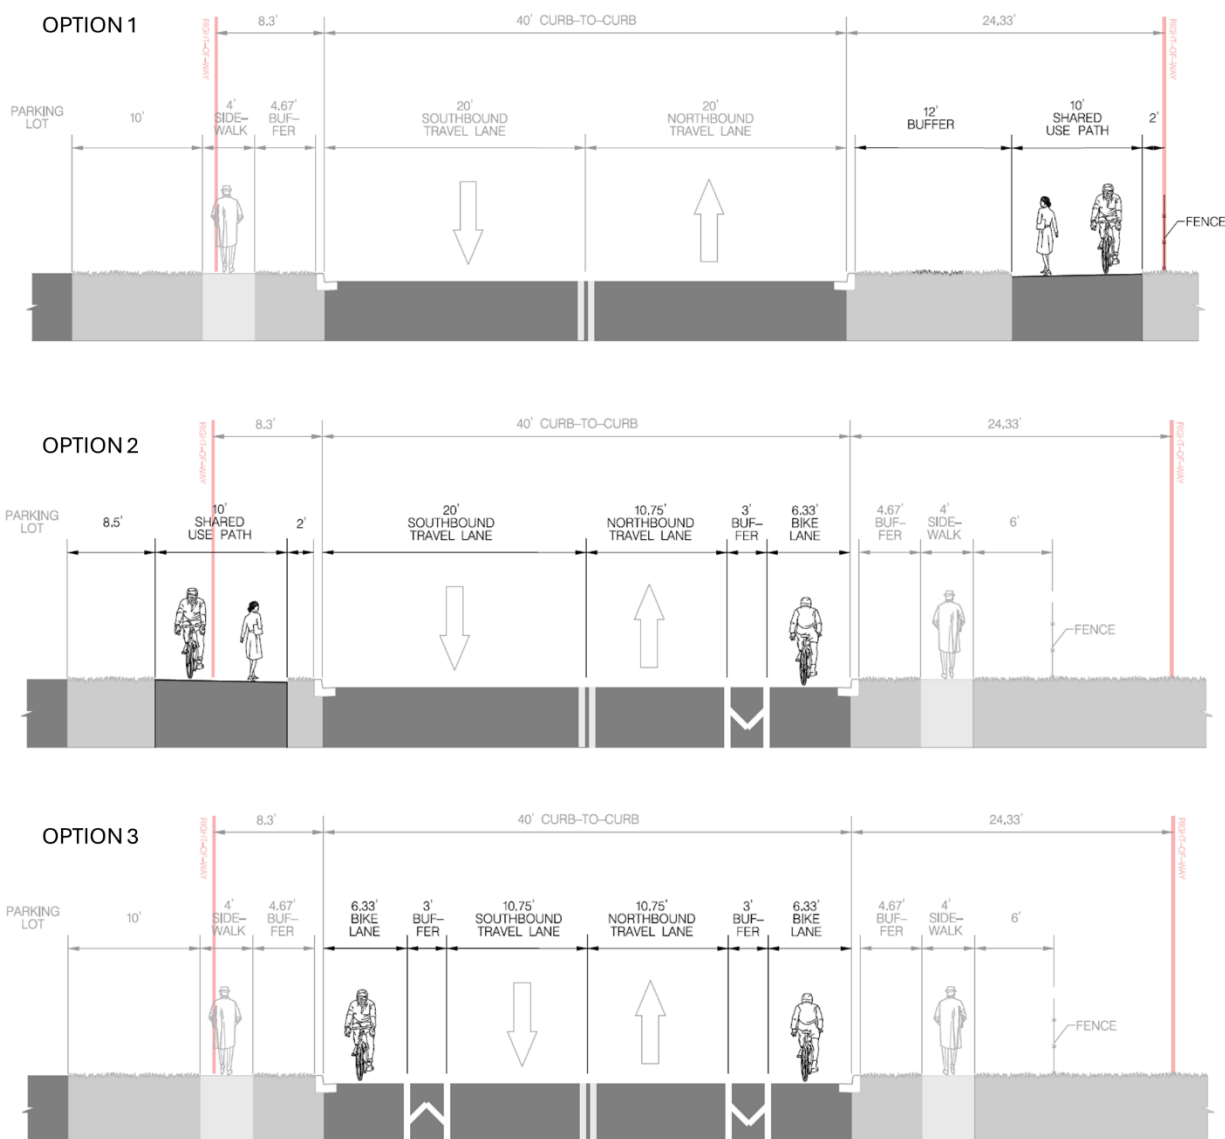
3 proposed typical cross sections for Auburn Ave between Riverdale Road and Brier's Mill Run
